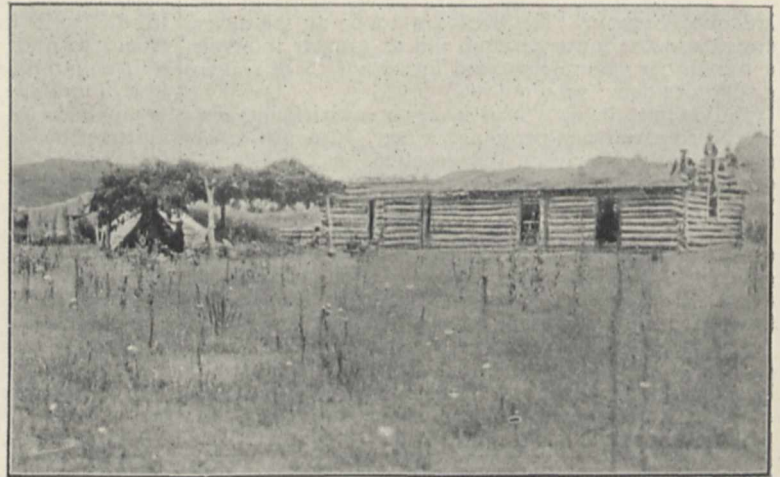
Oglala Dwellings. Triple log-house under construction and temporary tent-house.
